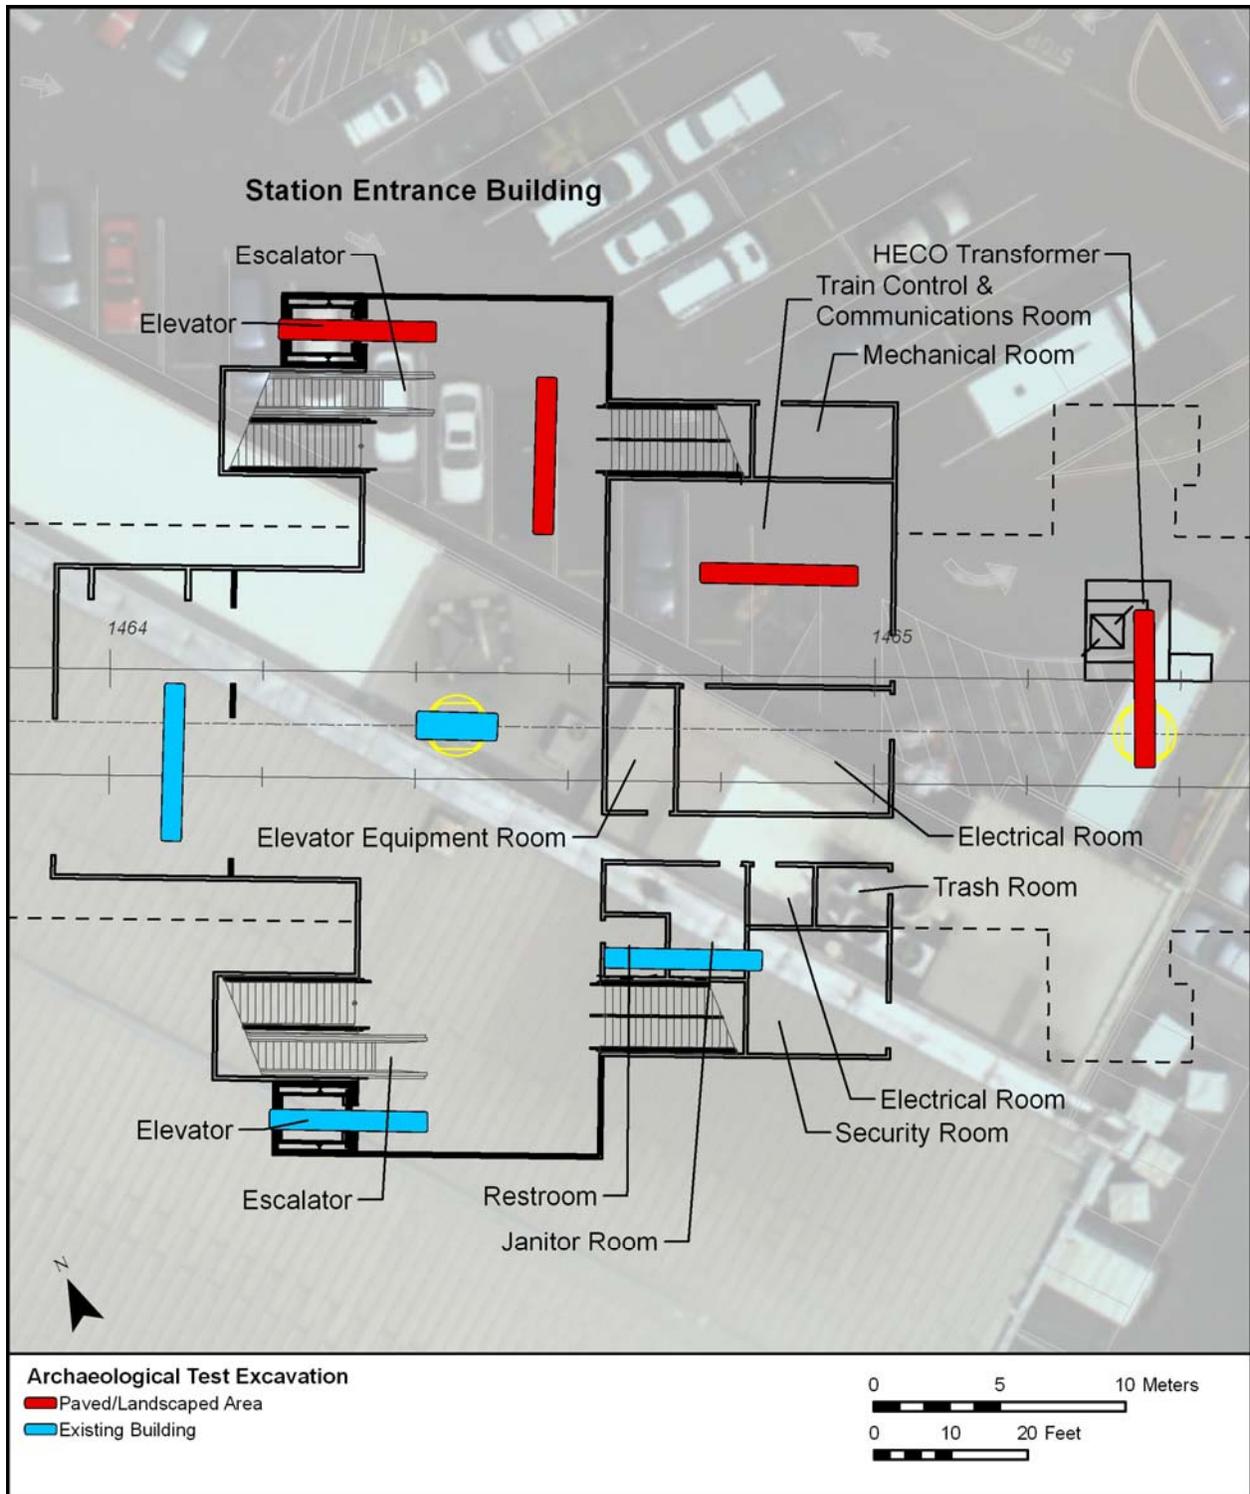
Kaka'ako Station, detail of building foundation layout showing proposed locations for archaeological inventory survey testing (six 2' by 20' test trenches at Station Entrance Building)
